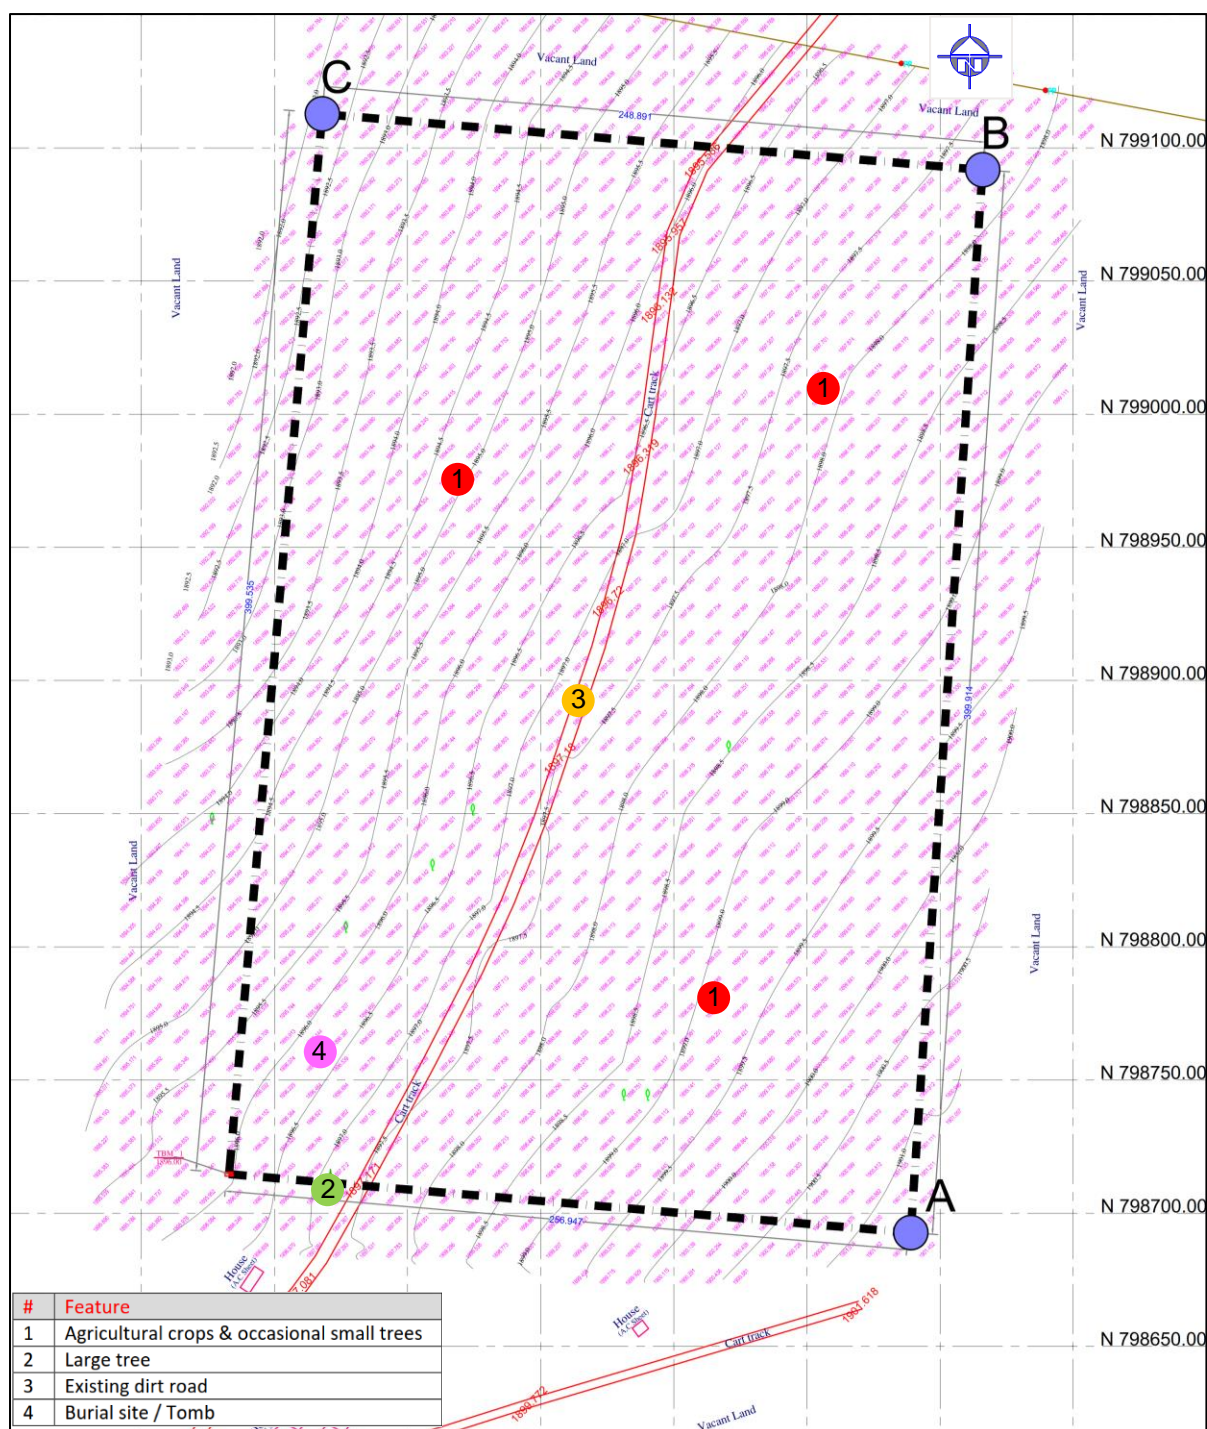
Existing features within the proposed RTC site (adapted from MACE site constraints drawing)
